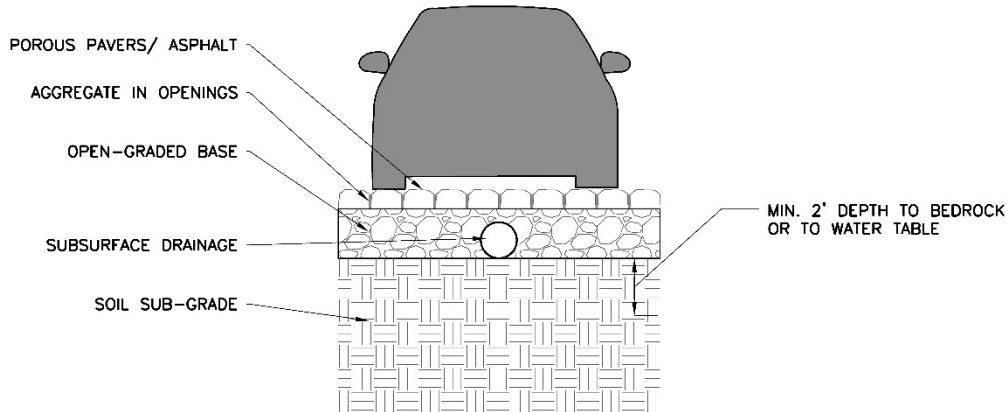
Porous Pavers / Asphalt Cross-Section
